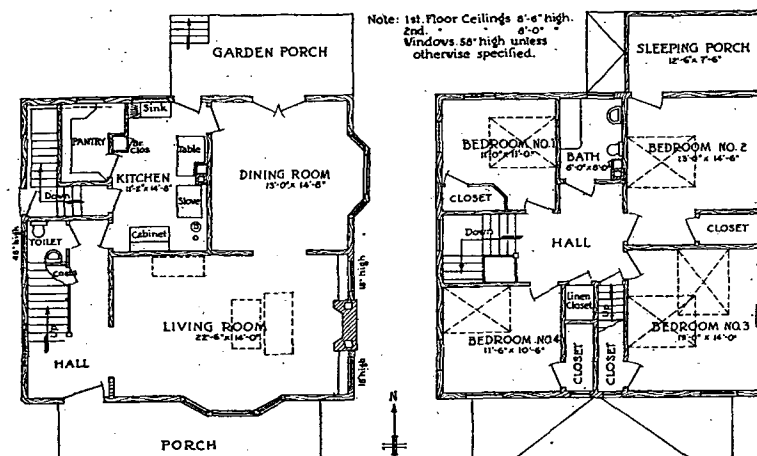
FLOOR PLANS OF HOUSE USED IN TYPICAL DESIGN PROBLEM
